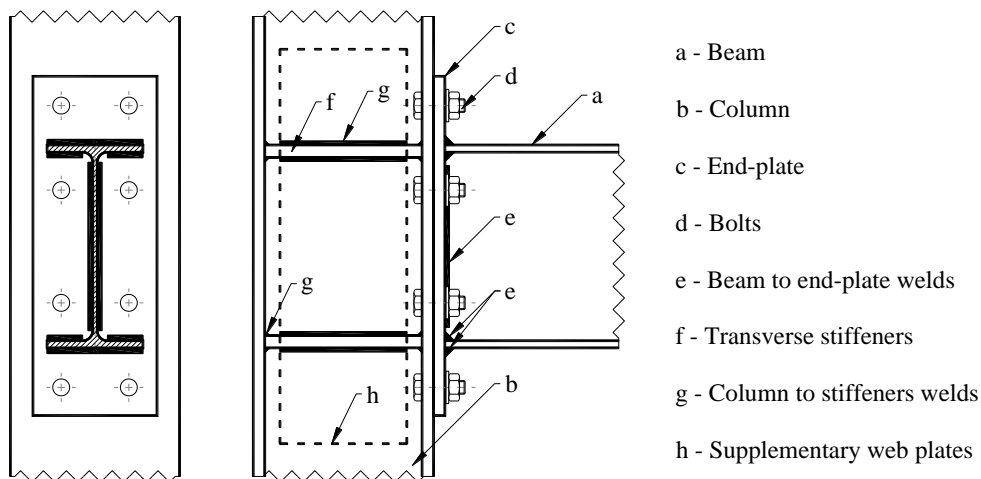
Typical beam-to-column double-extended end-plate bolted connection.
